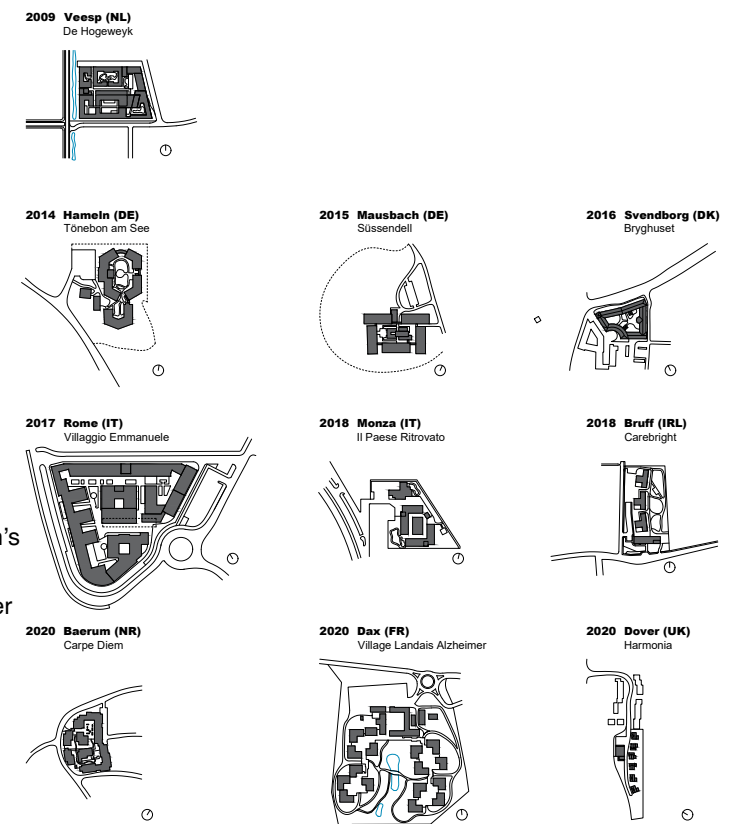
Plans of Dementia Villages. Drawing by the author.
